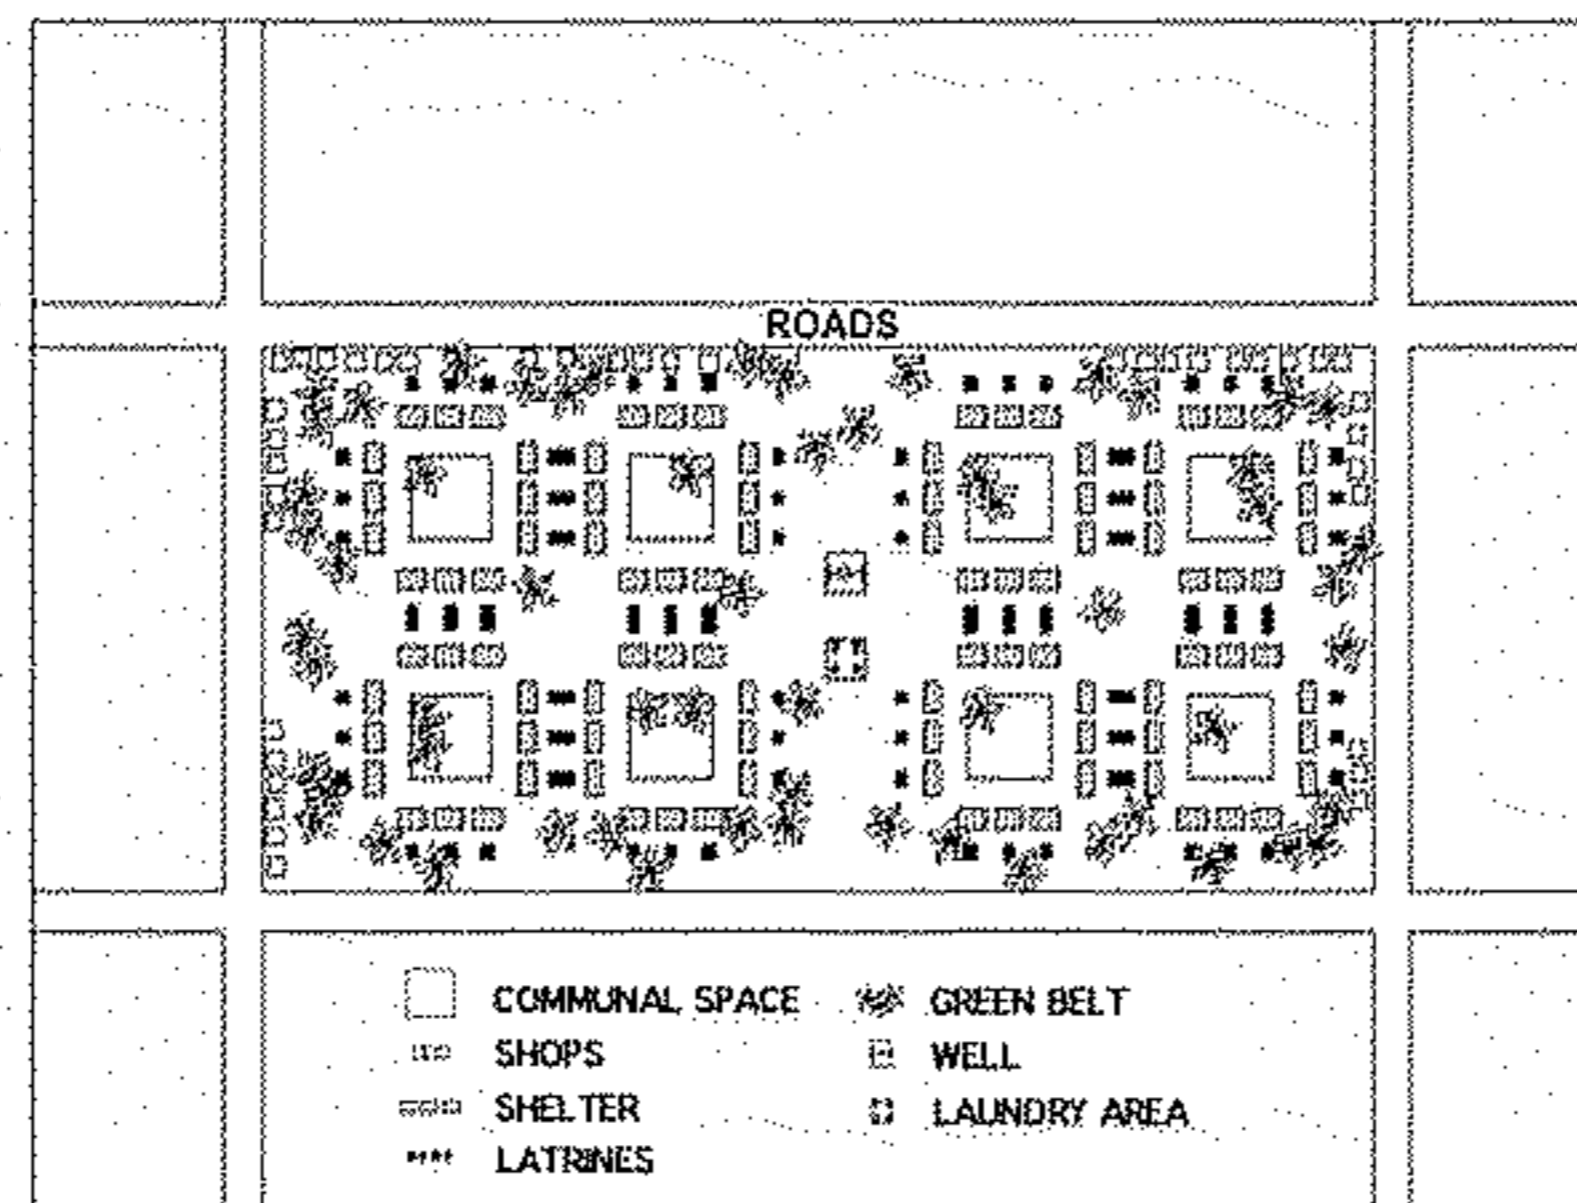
Site plan for a typical IRC block. Source: IRC Shelter Manual Handbook p. 13
